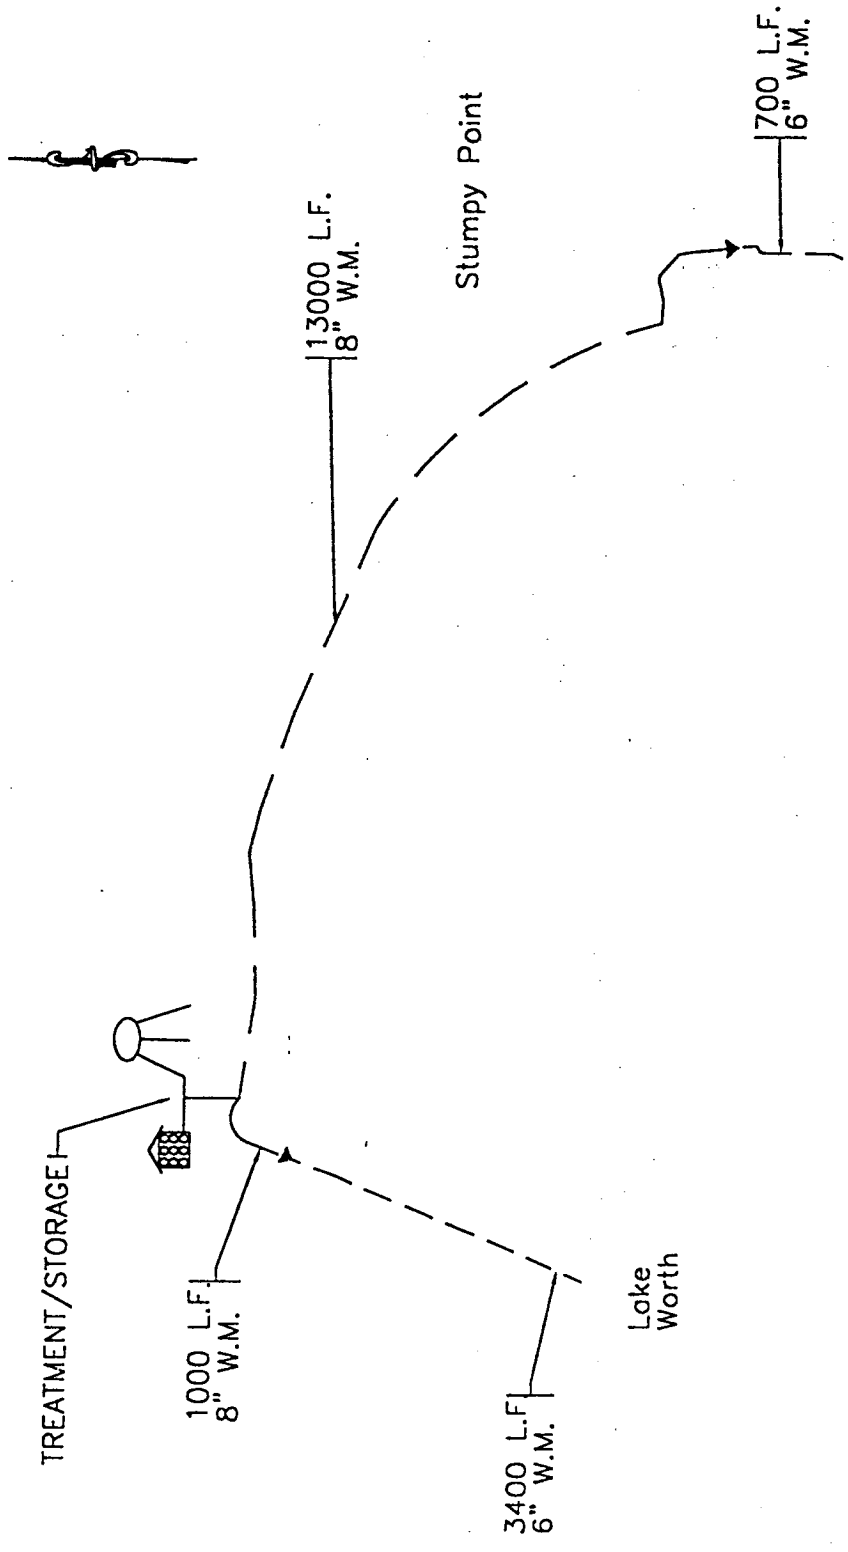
SYSTEM LAYOUT WITH FIRE PROTECTION AND UTILIZATION OF THE SITE NEAR THE N.C. HWY 264 AND SR 1100 INTERSECTION.
